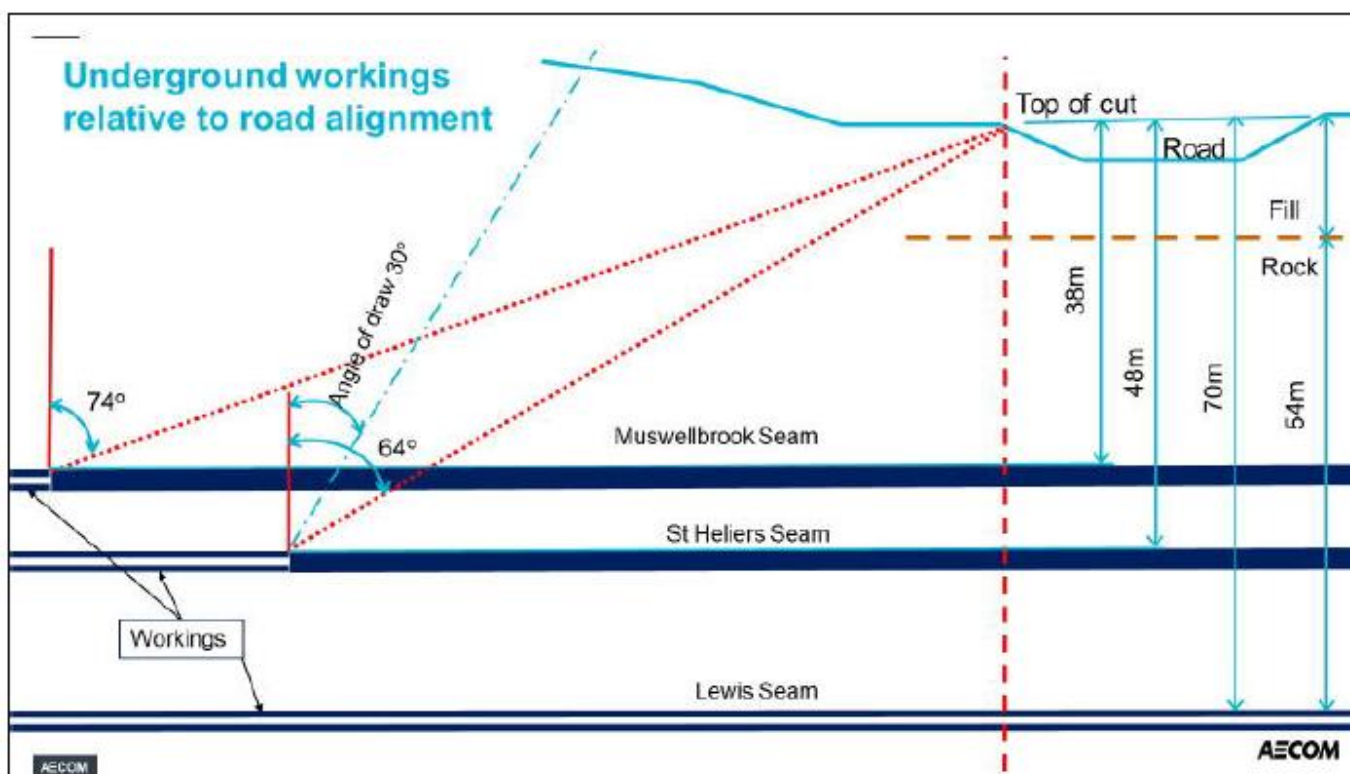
Former underground workings relative to the proposed road corridor/alignment
